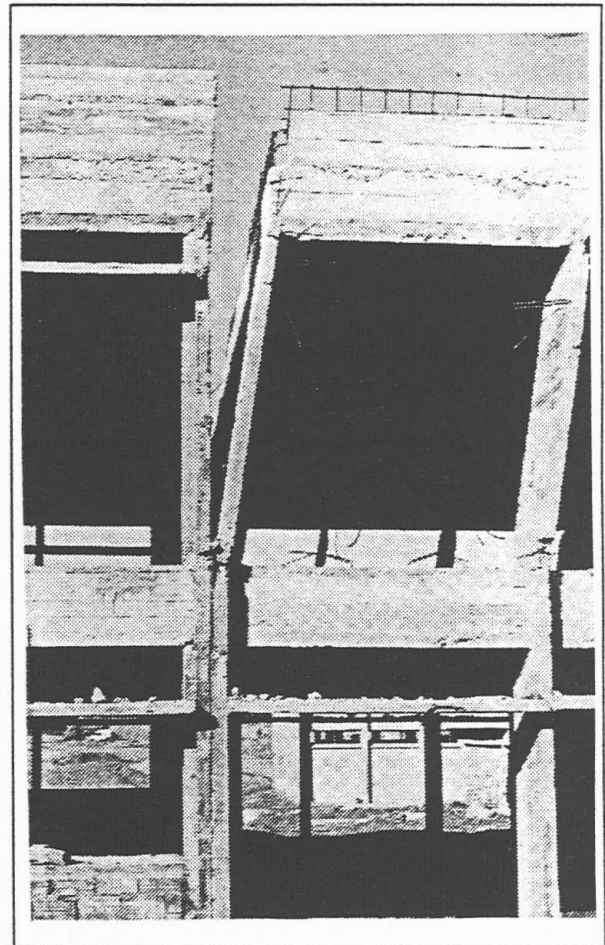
A building separated by an expansion joint but not by an adequate gap was probably damaged because of interaction between the two sections.
